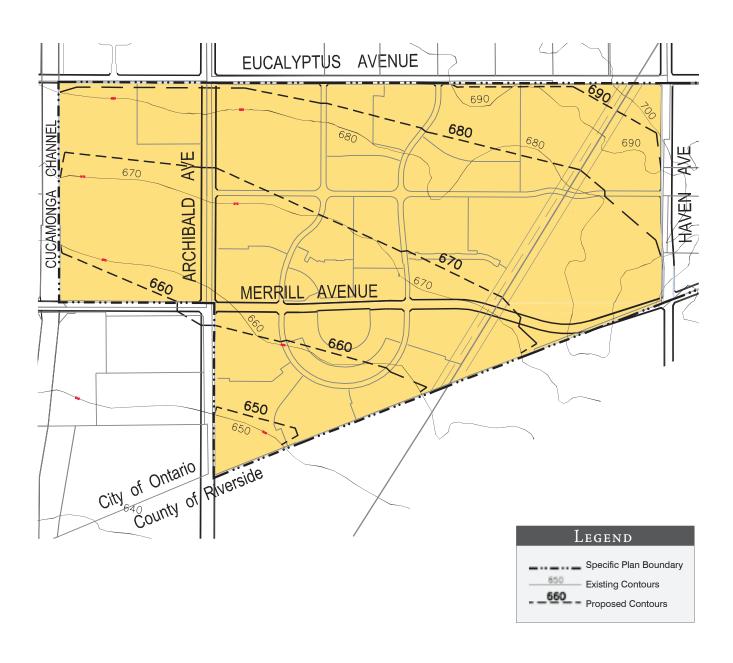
CONCEPTUAL GRADING PLAN
